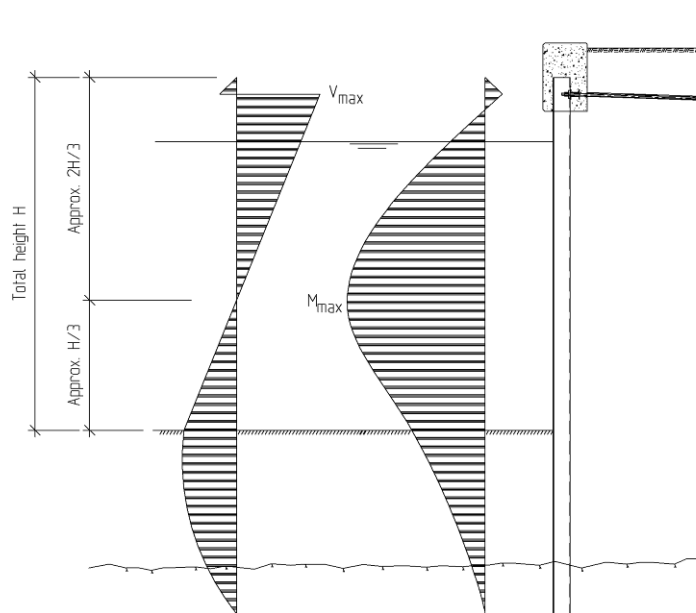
Bending moment (M) and shear force (V) diagrams for a standard back anchored sheet pile wall
